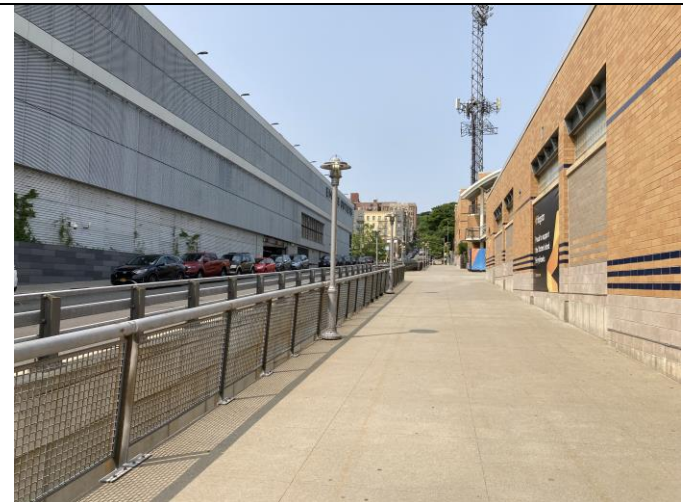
Paved concrete sidewalk, pavers, and roadway located east of Ballpark Site (looking south).
